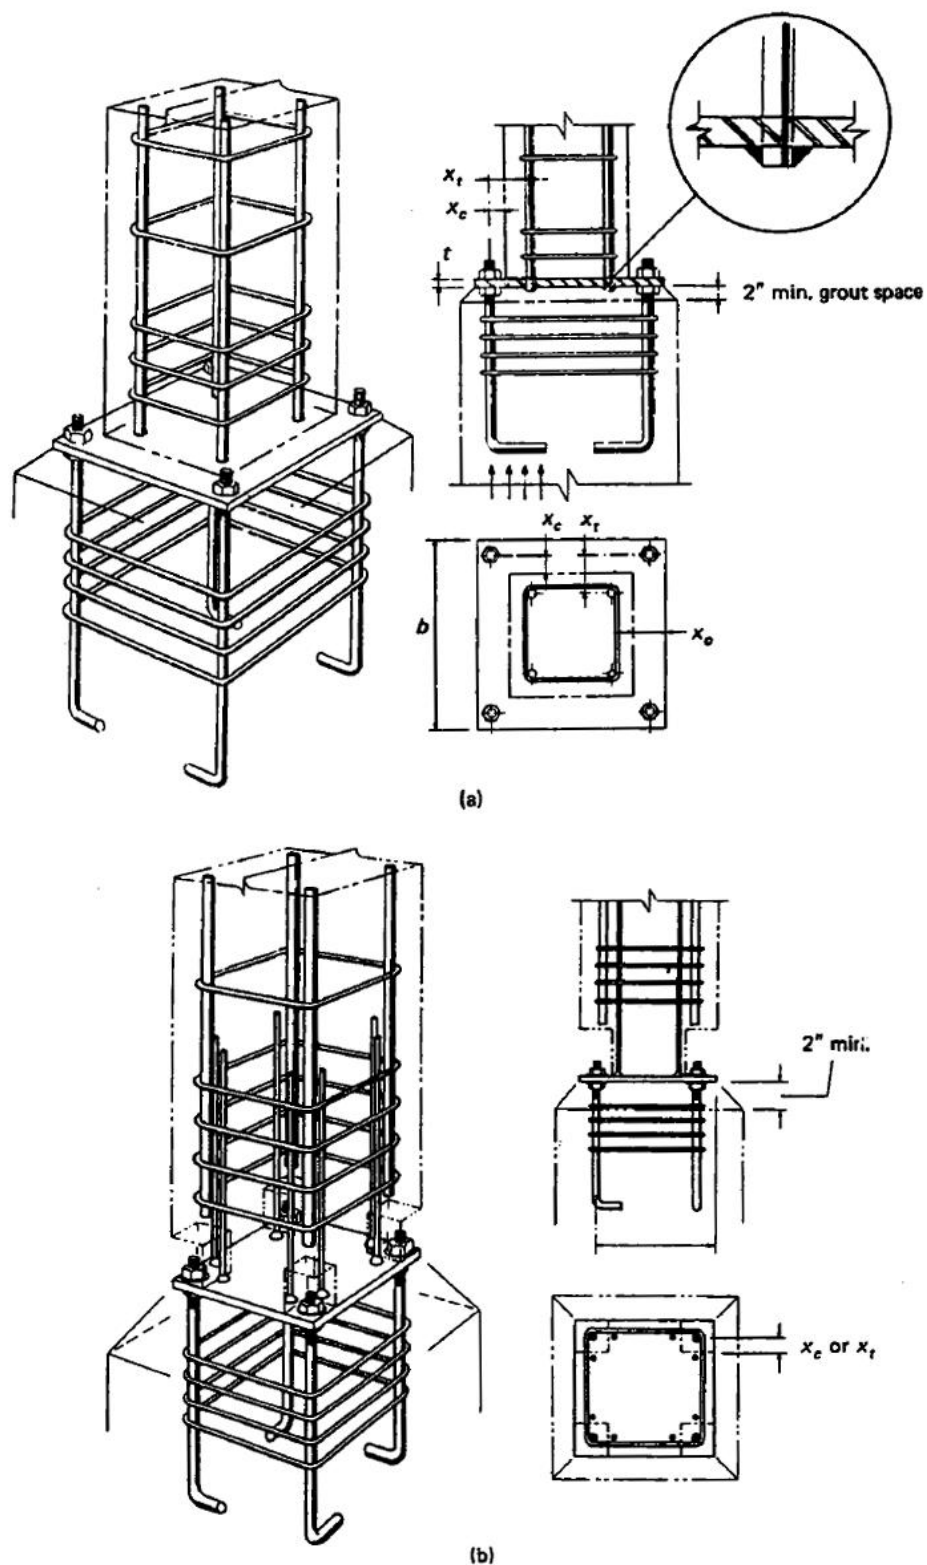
Column base connections. (a) Base plate larger than column. (b) Flush base plate.
